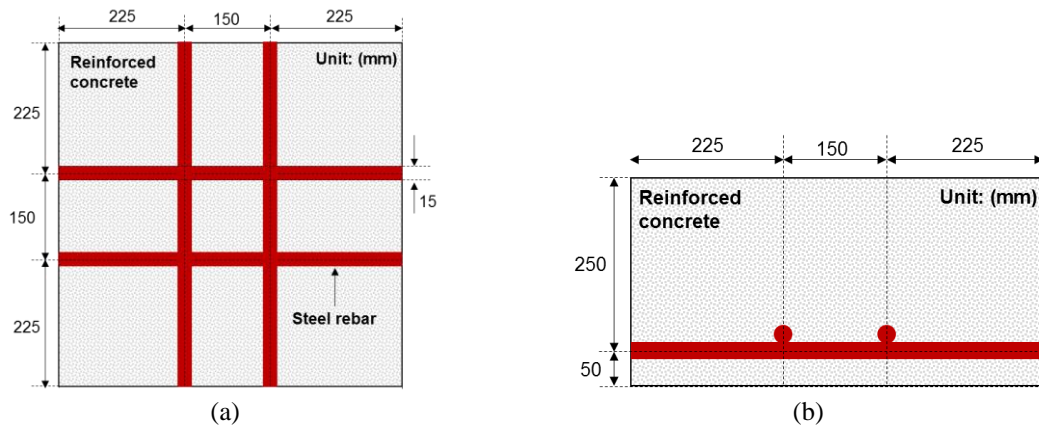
A 300 mm-thick reinforced concrete specimen with Φ 15 mm steel rebar: (a) a top and (b) side view
